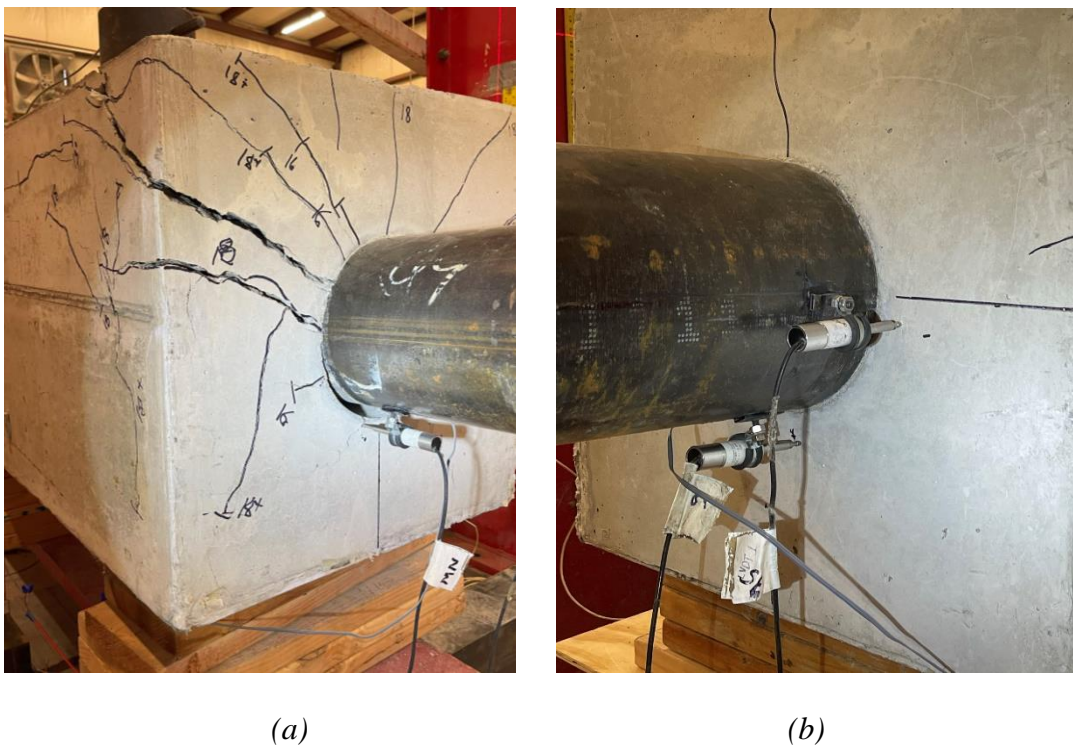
Steel pipe at the (a) north side and (b) south side of the footing at failure for specimen CF-3
